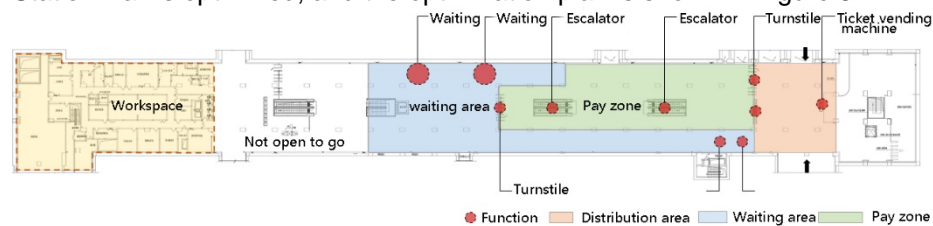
Optimized layout plan for the space of the hall floor of Xiping West Station. Source: self drawn by the author.
